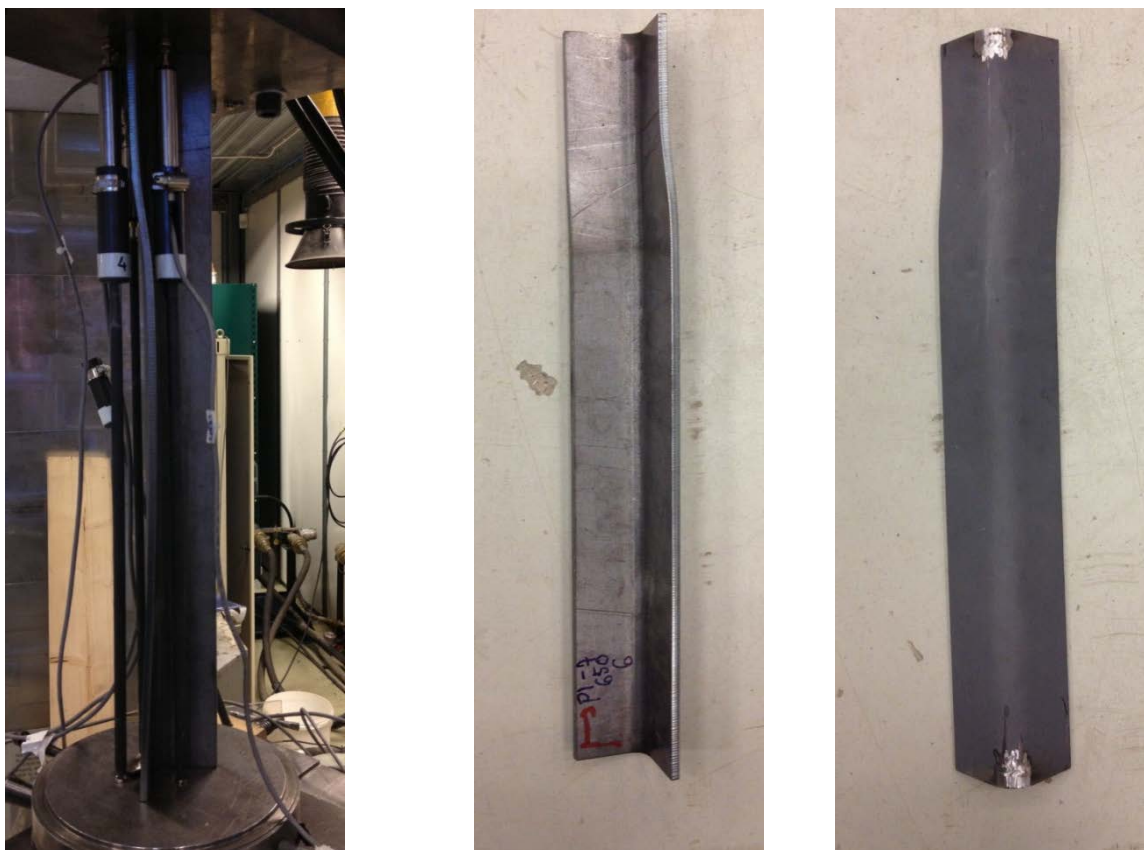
Deformation of specimen P1-7-6mm (typical failure for P1-6, P2-4, P2-6, P3-6).
